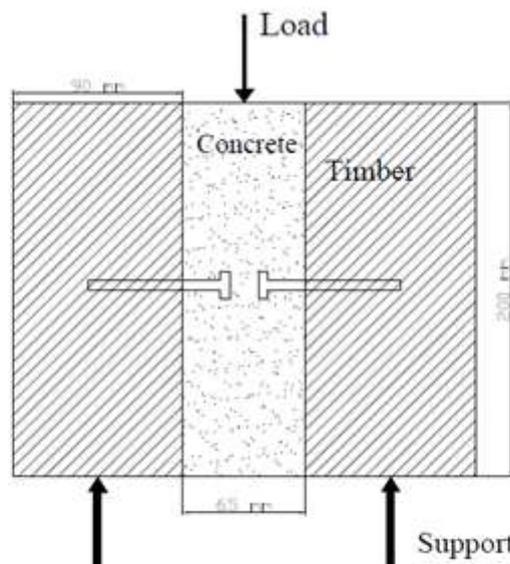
Push out test specimen typical side elevation for single timber (T1)
